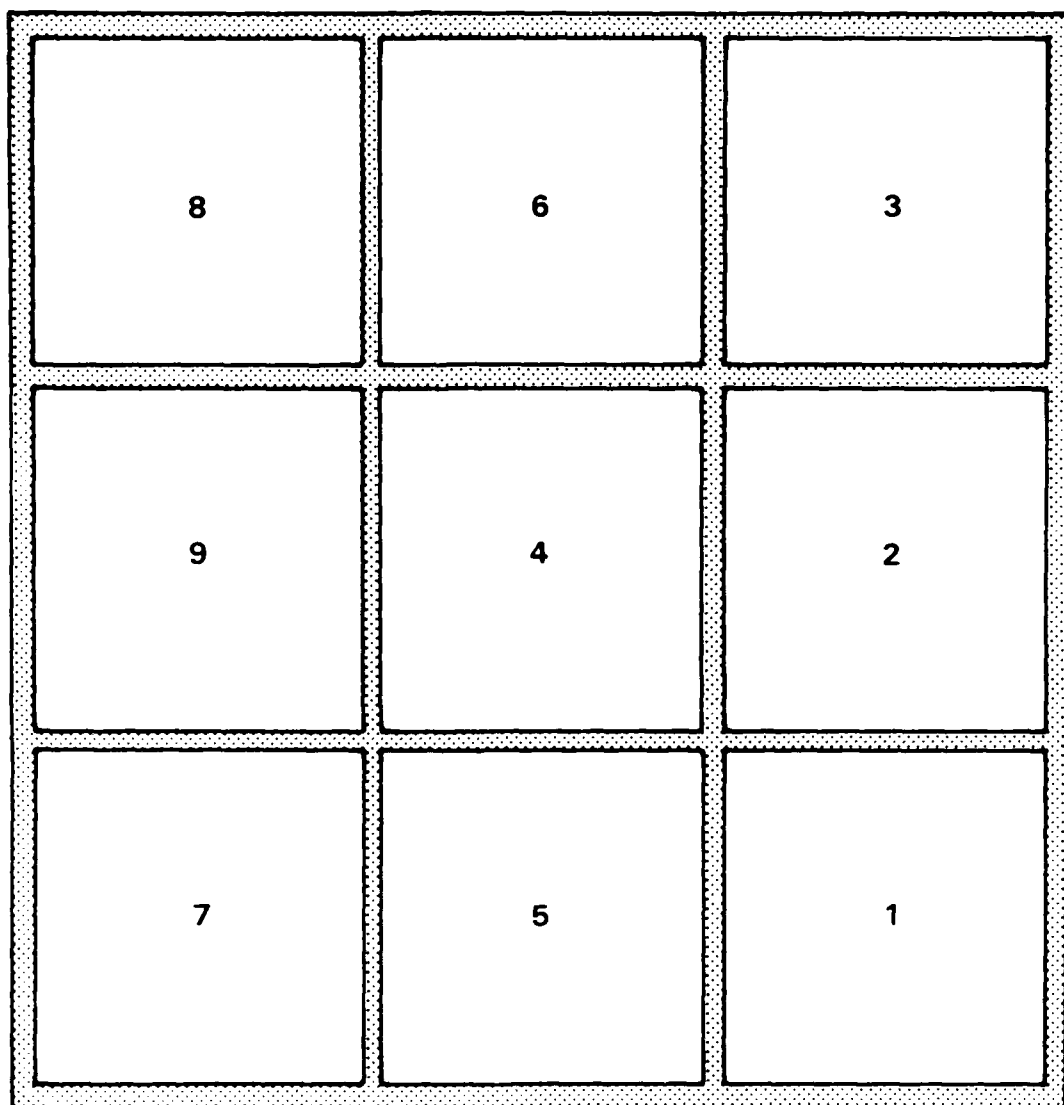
Plan of Test Section, Normal Strength USAFE Slabs.
